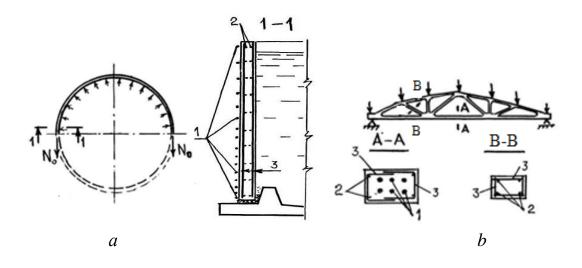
Tensile reinforced concrete elements: a - walls of a cylindrical tank; b - the lower chord of segmental truss; 1, 2 - tensile reinforcement; <math>3 - constructive reinforcement
